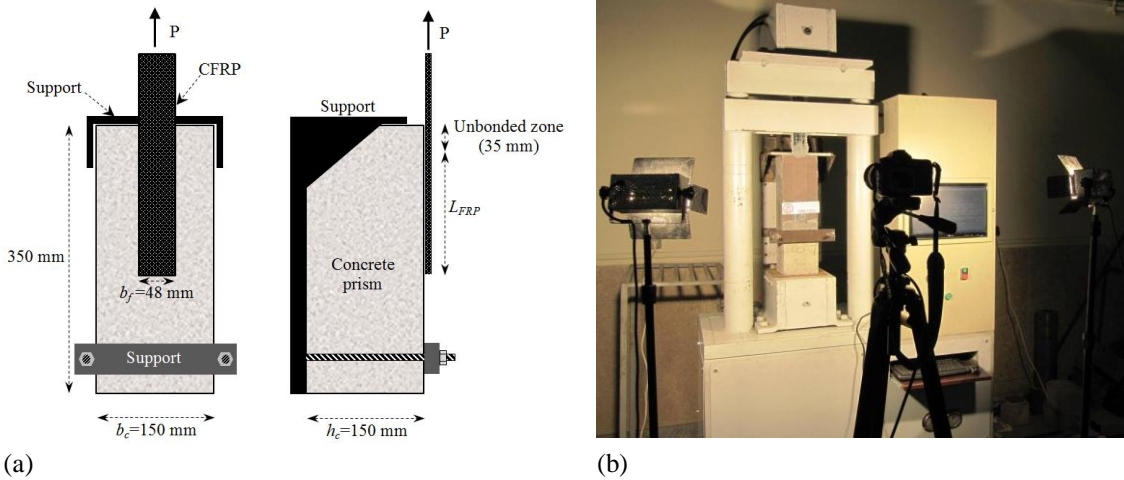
a) Testing arrangement and specimen dimensions; b) tension machine and test setup.
